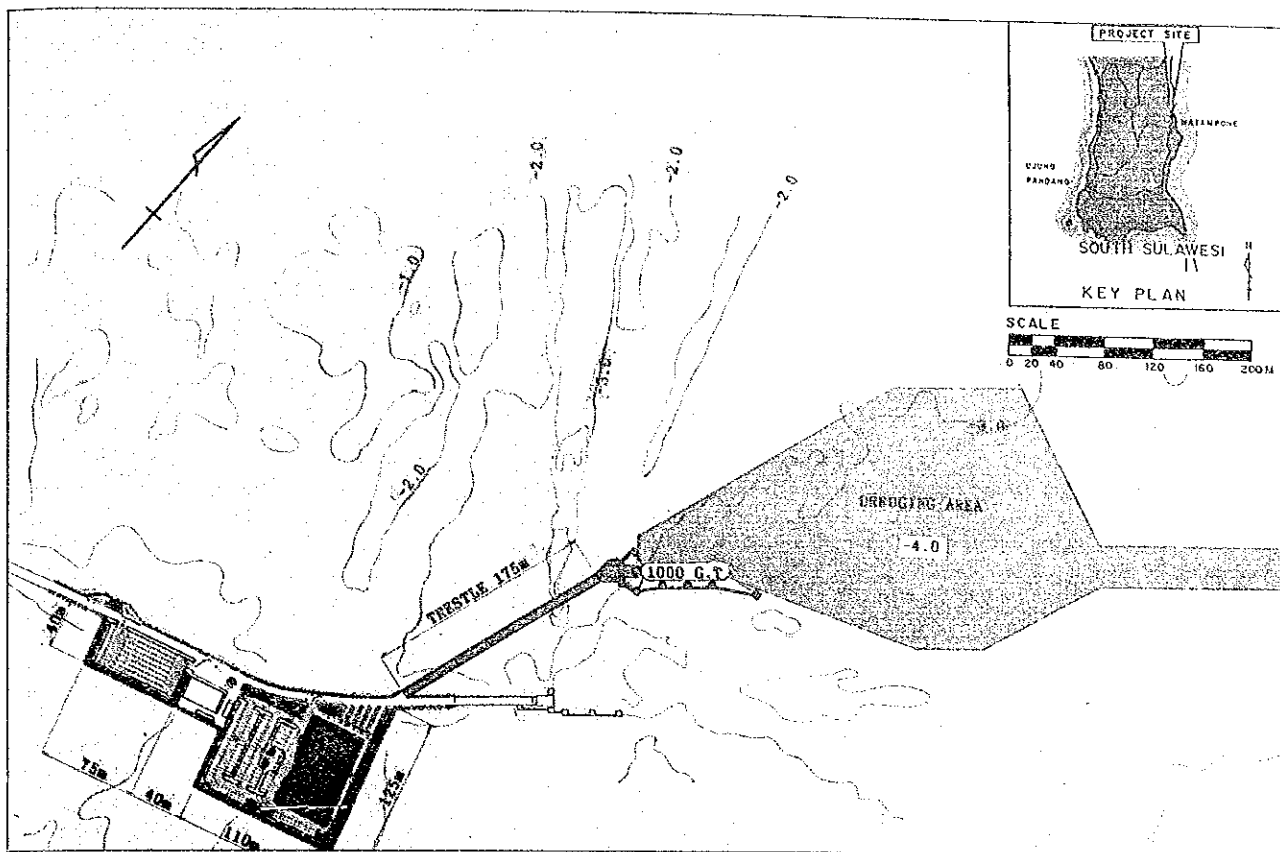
Layout of Bajoe Ferry Terminal
